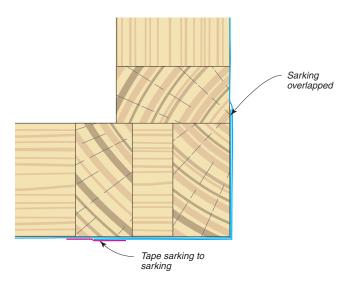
Typical Detail for Taping of Wall Wrap/Sarking Overlaps – Plan View
